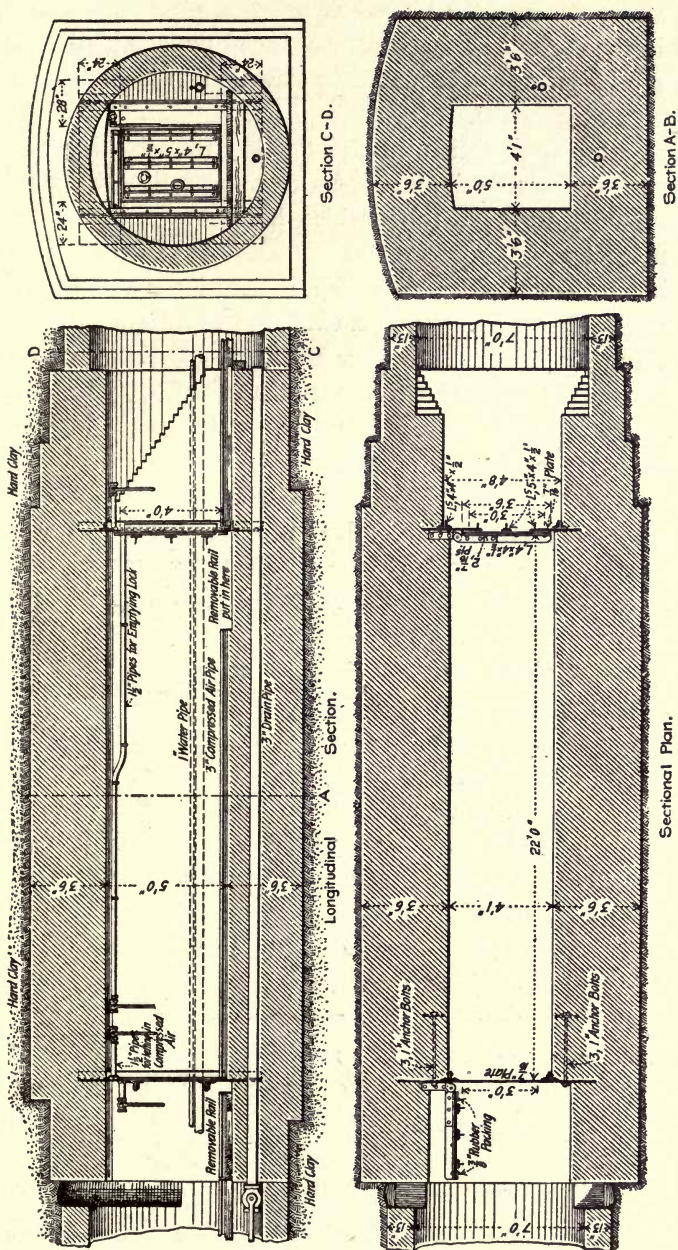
Hyde Park Tunnel: Air-lock in 7-foot Tunnel.
